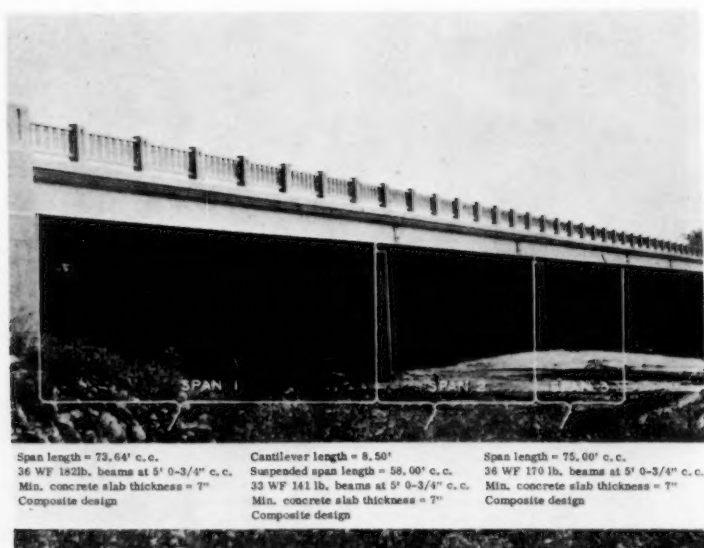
Bridge B1 of 73-20-2. On routes M-46 and M-47 west of Saginaw. Five-span rolled beam cantilever-type bridge.
